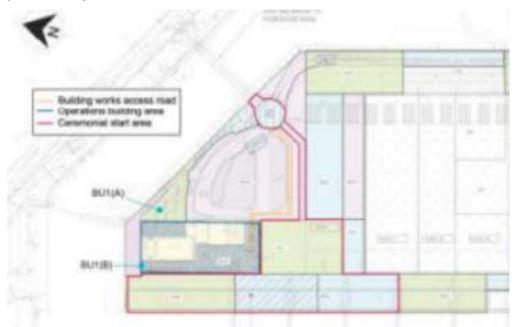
Access Rd. (Figure 3 of LORAC SPBT3 Construction Traffic Management Plan – V03
